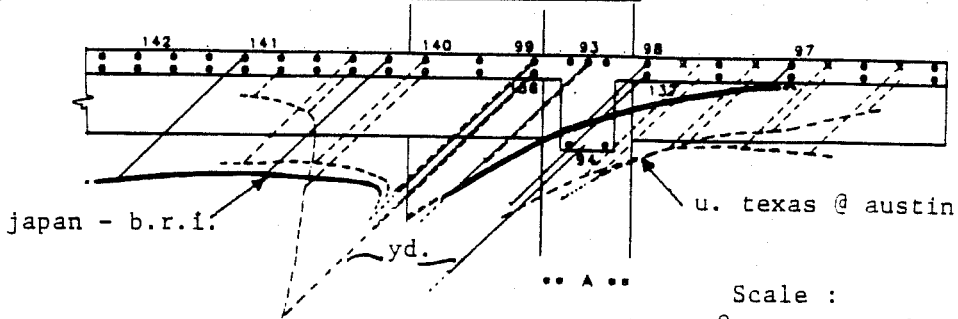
Exterior Joint Slab Steel Yielding.
